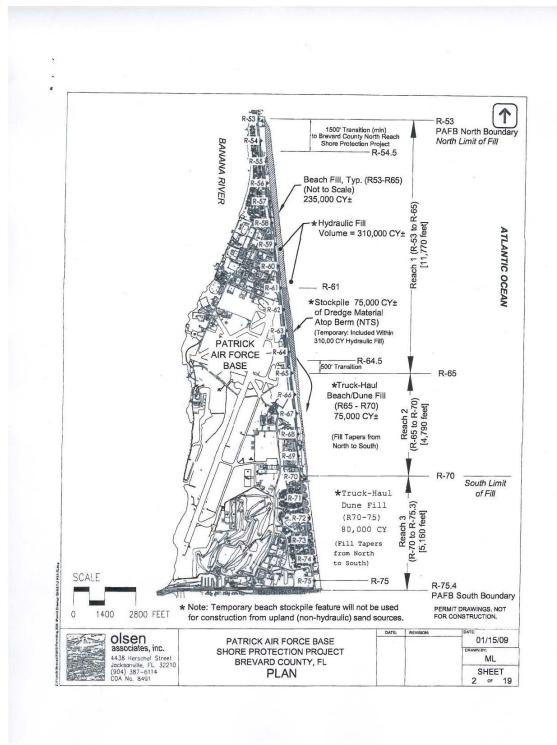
PAFB SHORE PROTECTION PROJECT PLAN SCHEMATIC
